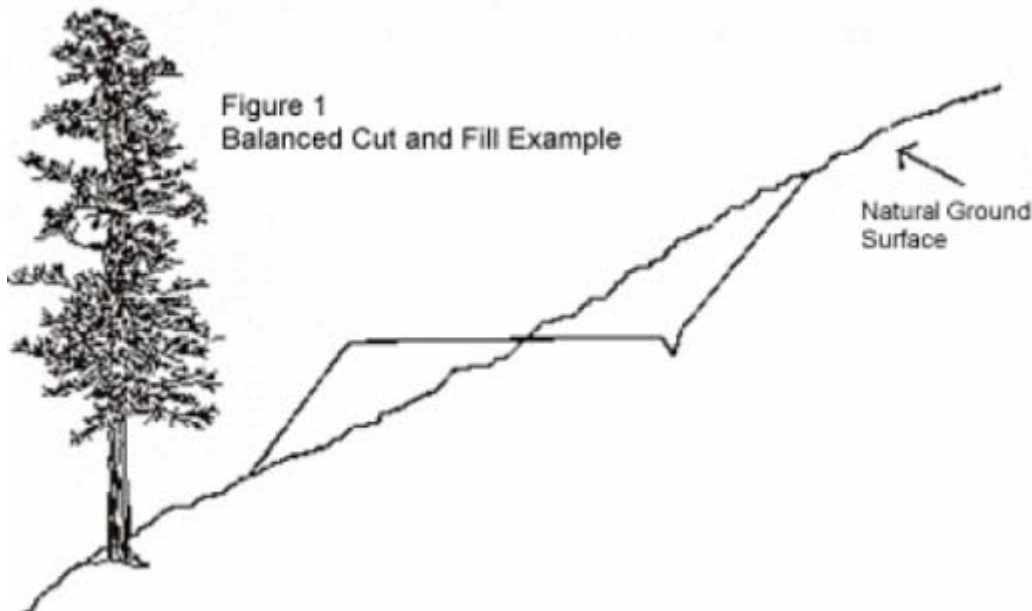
Bench construction, or balanced cut and fill. Source: [Forest Roads Manual](#), Section 4. Oregon Department of Forestry. Used with permission.
